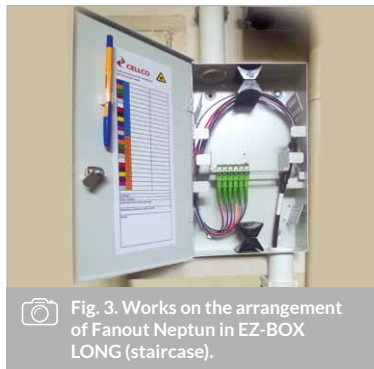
Works on the arrangement of Fanout Neptun in EZ-BOX LONG (staircase).
